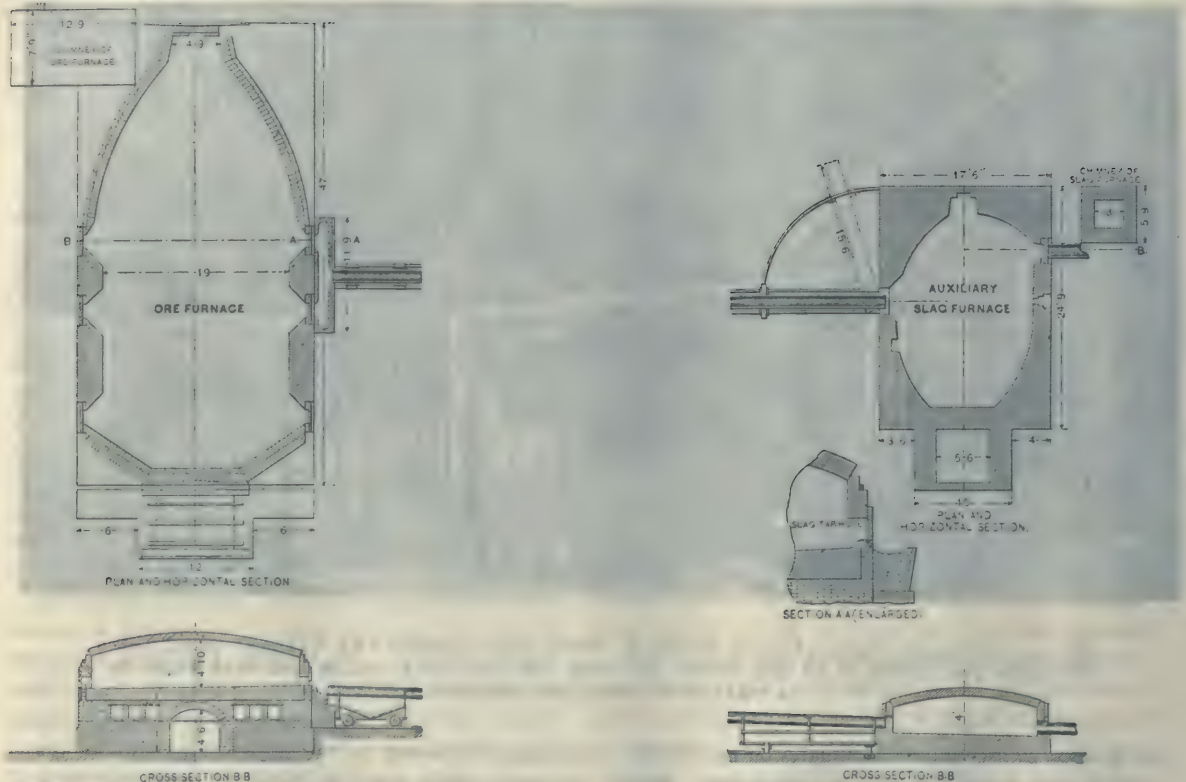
PLAN AND SECTION OF THE ORE FURNACE AND SLAG FURNACES AT ARGO.
